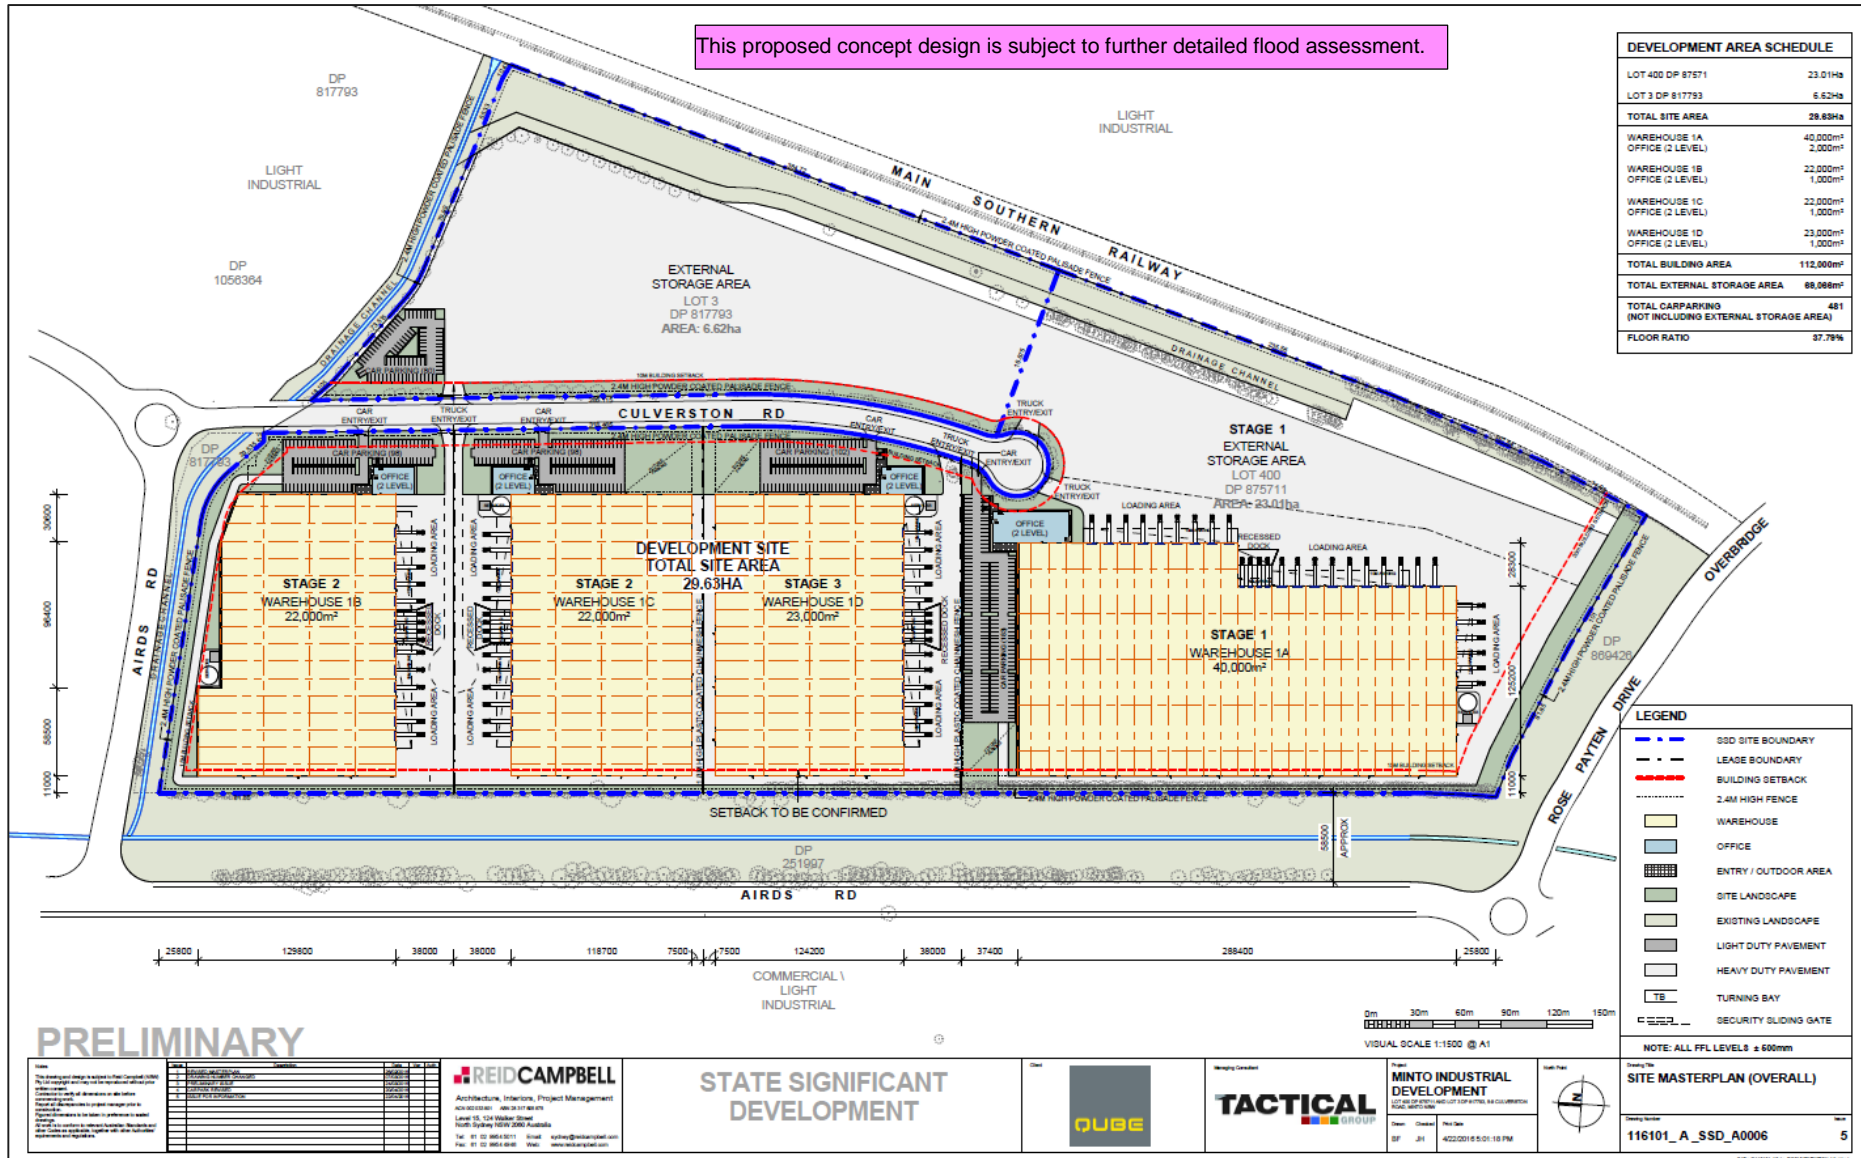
Concept Master Plan (refer to Appendix C for A3 size figure)
